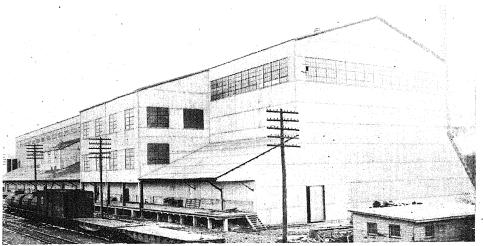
EXTERNAL VIEW OF BUILDING WITH LEAN-TO SIDES
